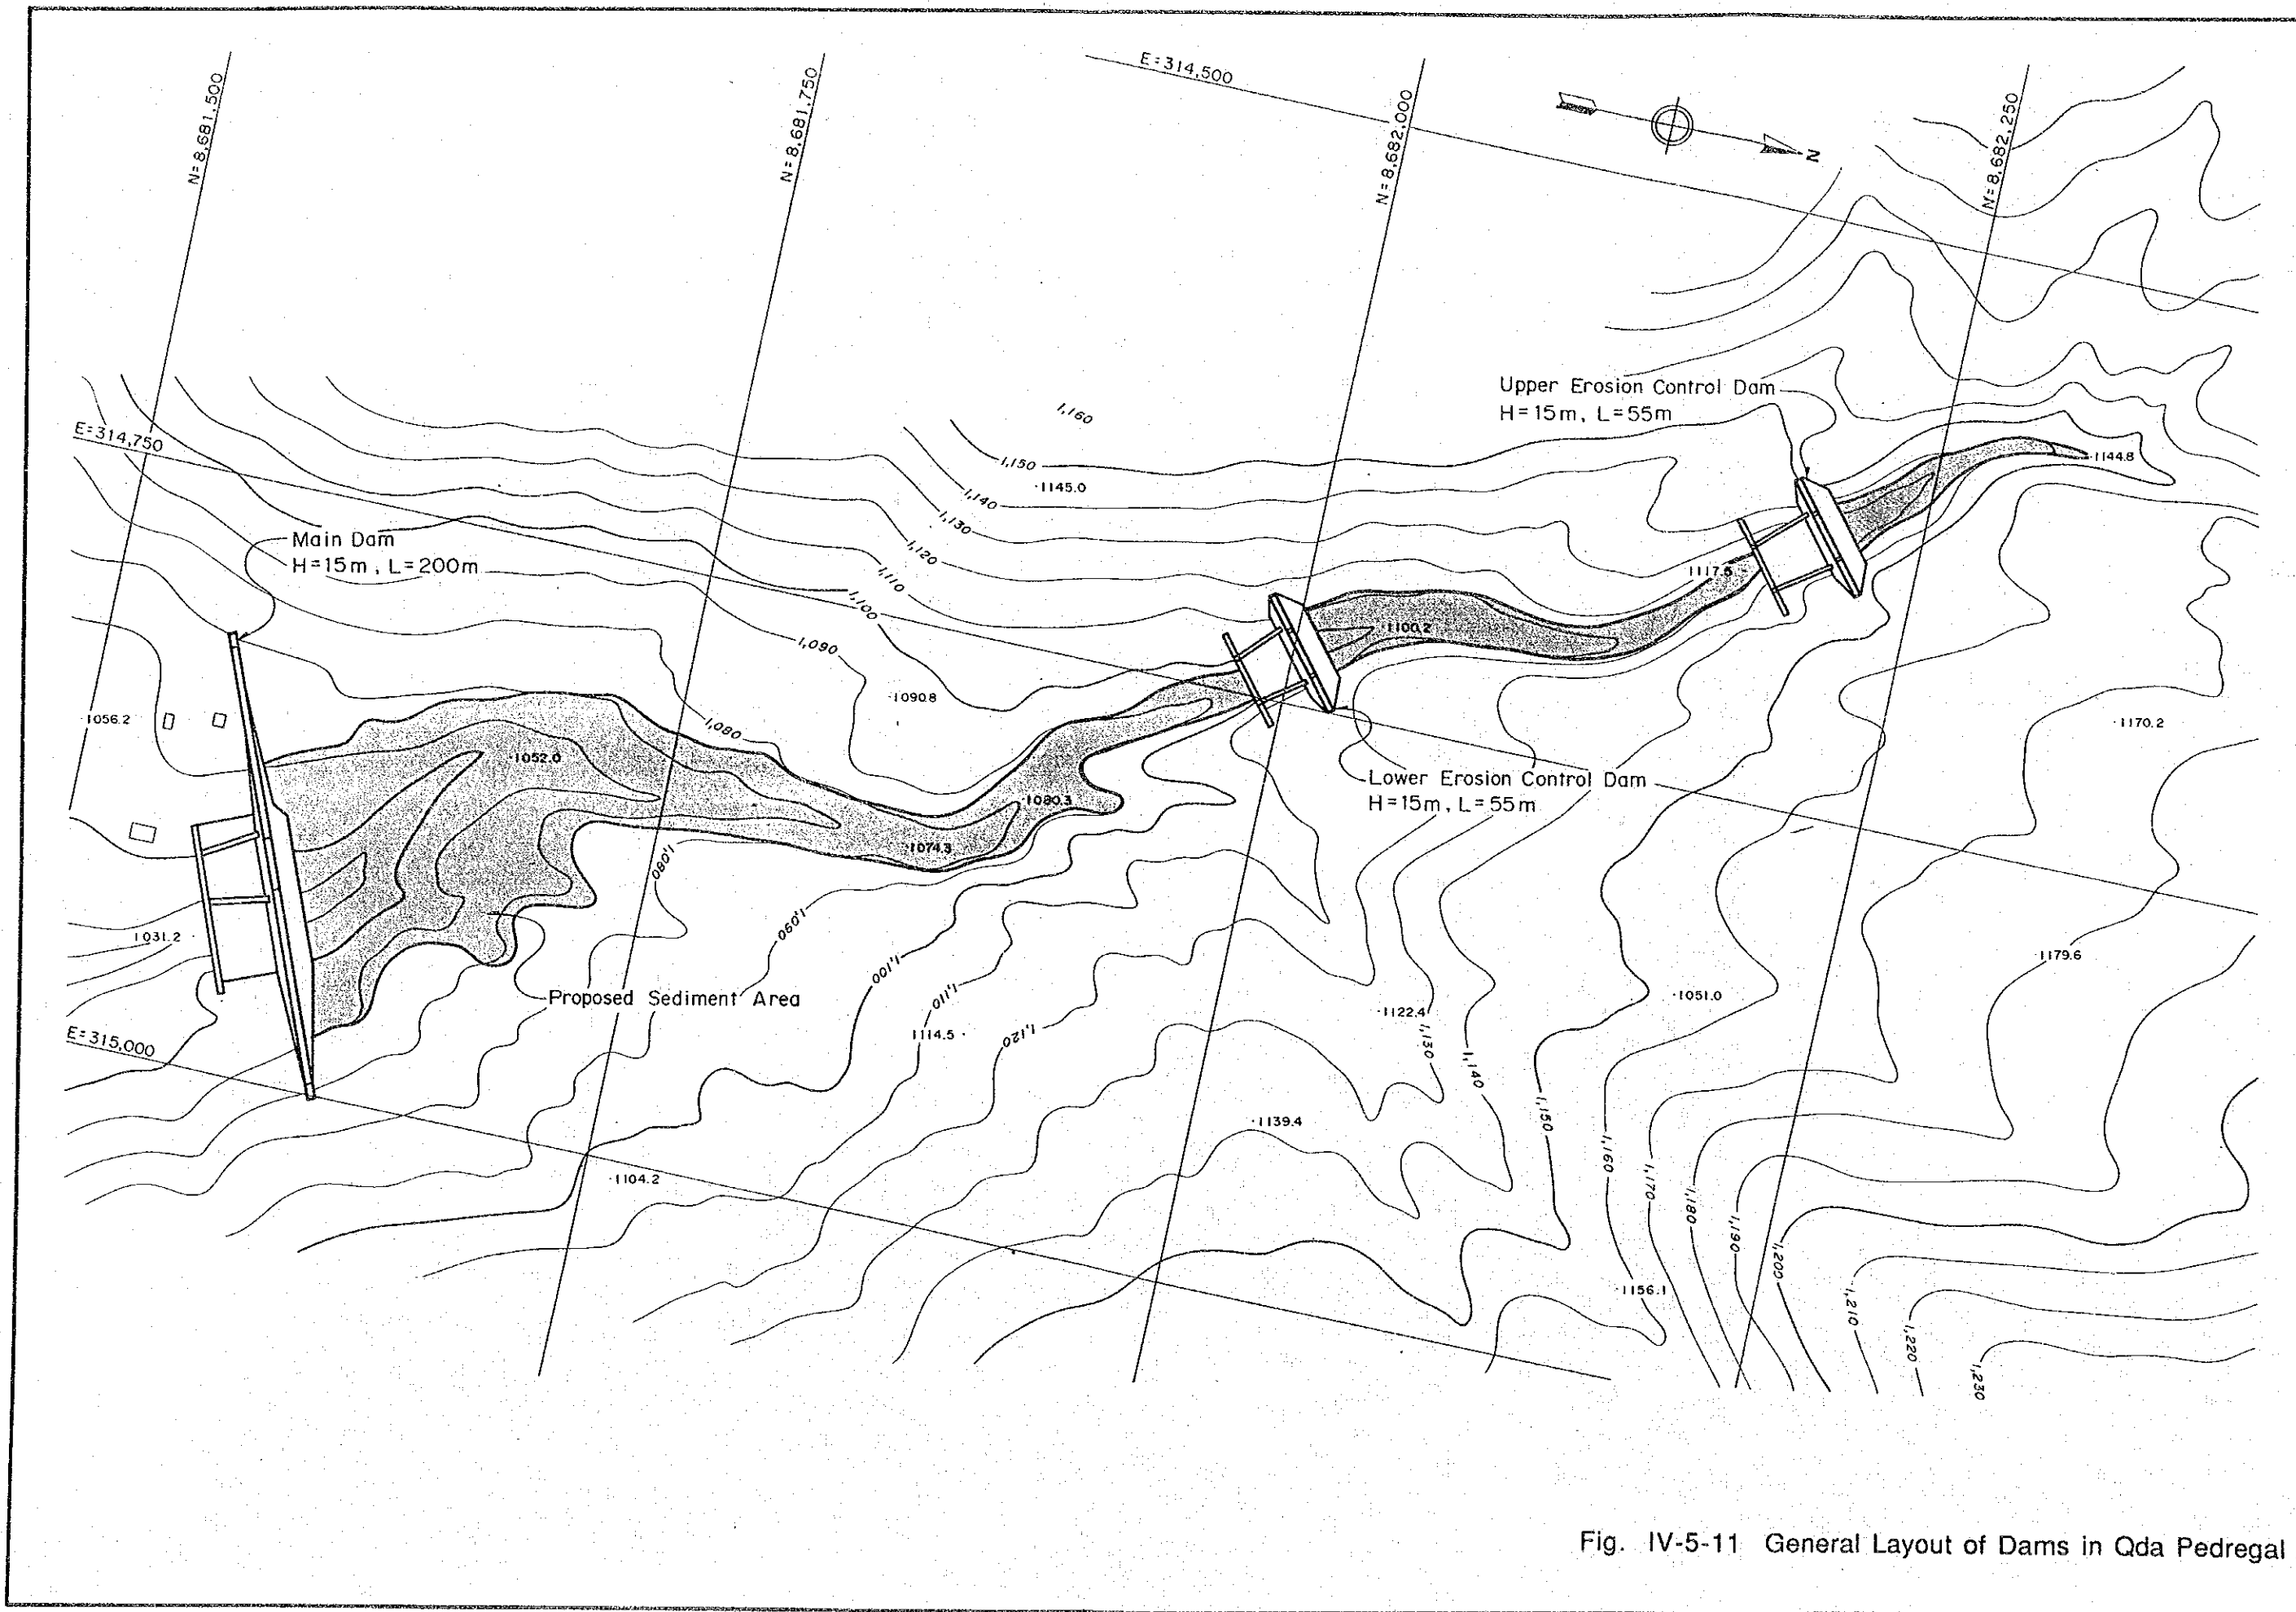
General Layout of Dams in Qda Pedregal
